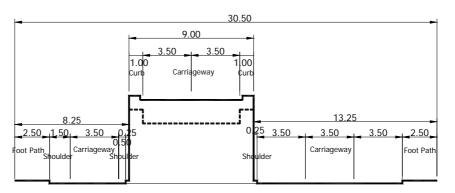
Proposed Flyover Cross Section (Southern Part)
